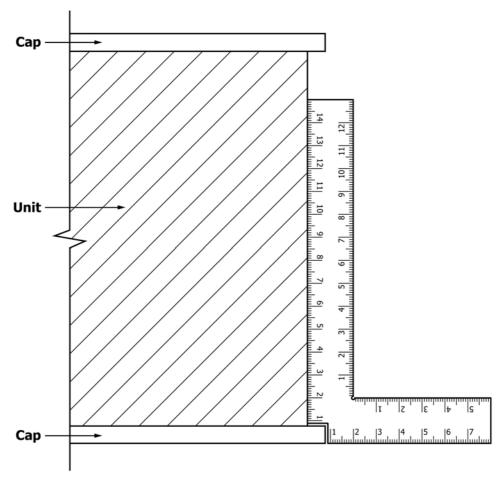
Example of a Carpenter's Square with a Notch Cut Out of the Bottom to Accommodate the Bottom Cap of the Specimen
